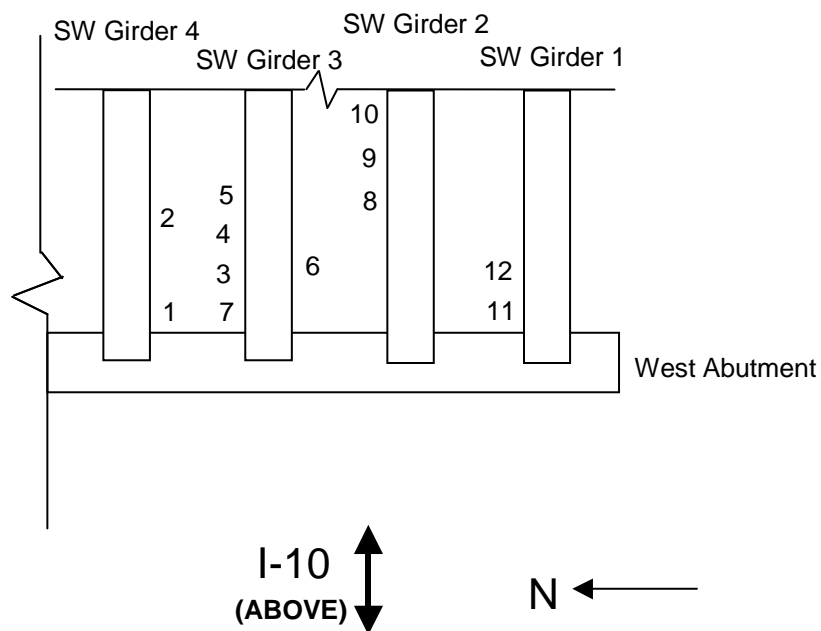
Schematic of crack-measurement locations on I-10 structure (plan view)
